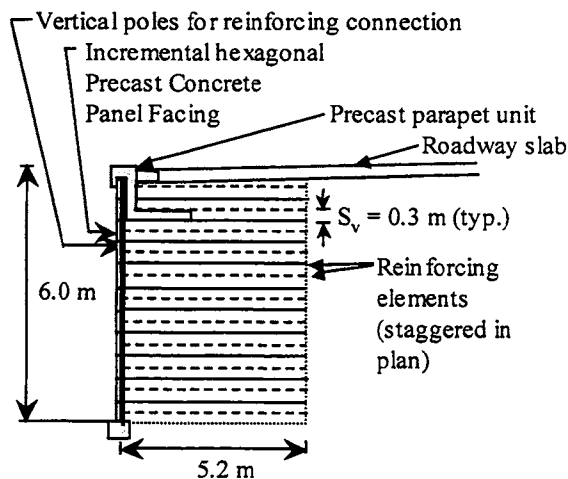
Guildford Bypass steel strip reinforced MSE wall (adapted from Murray and Hollinghurst, 1986).
